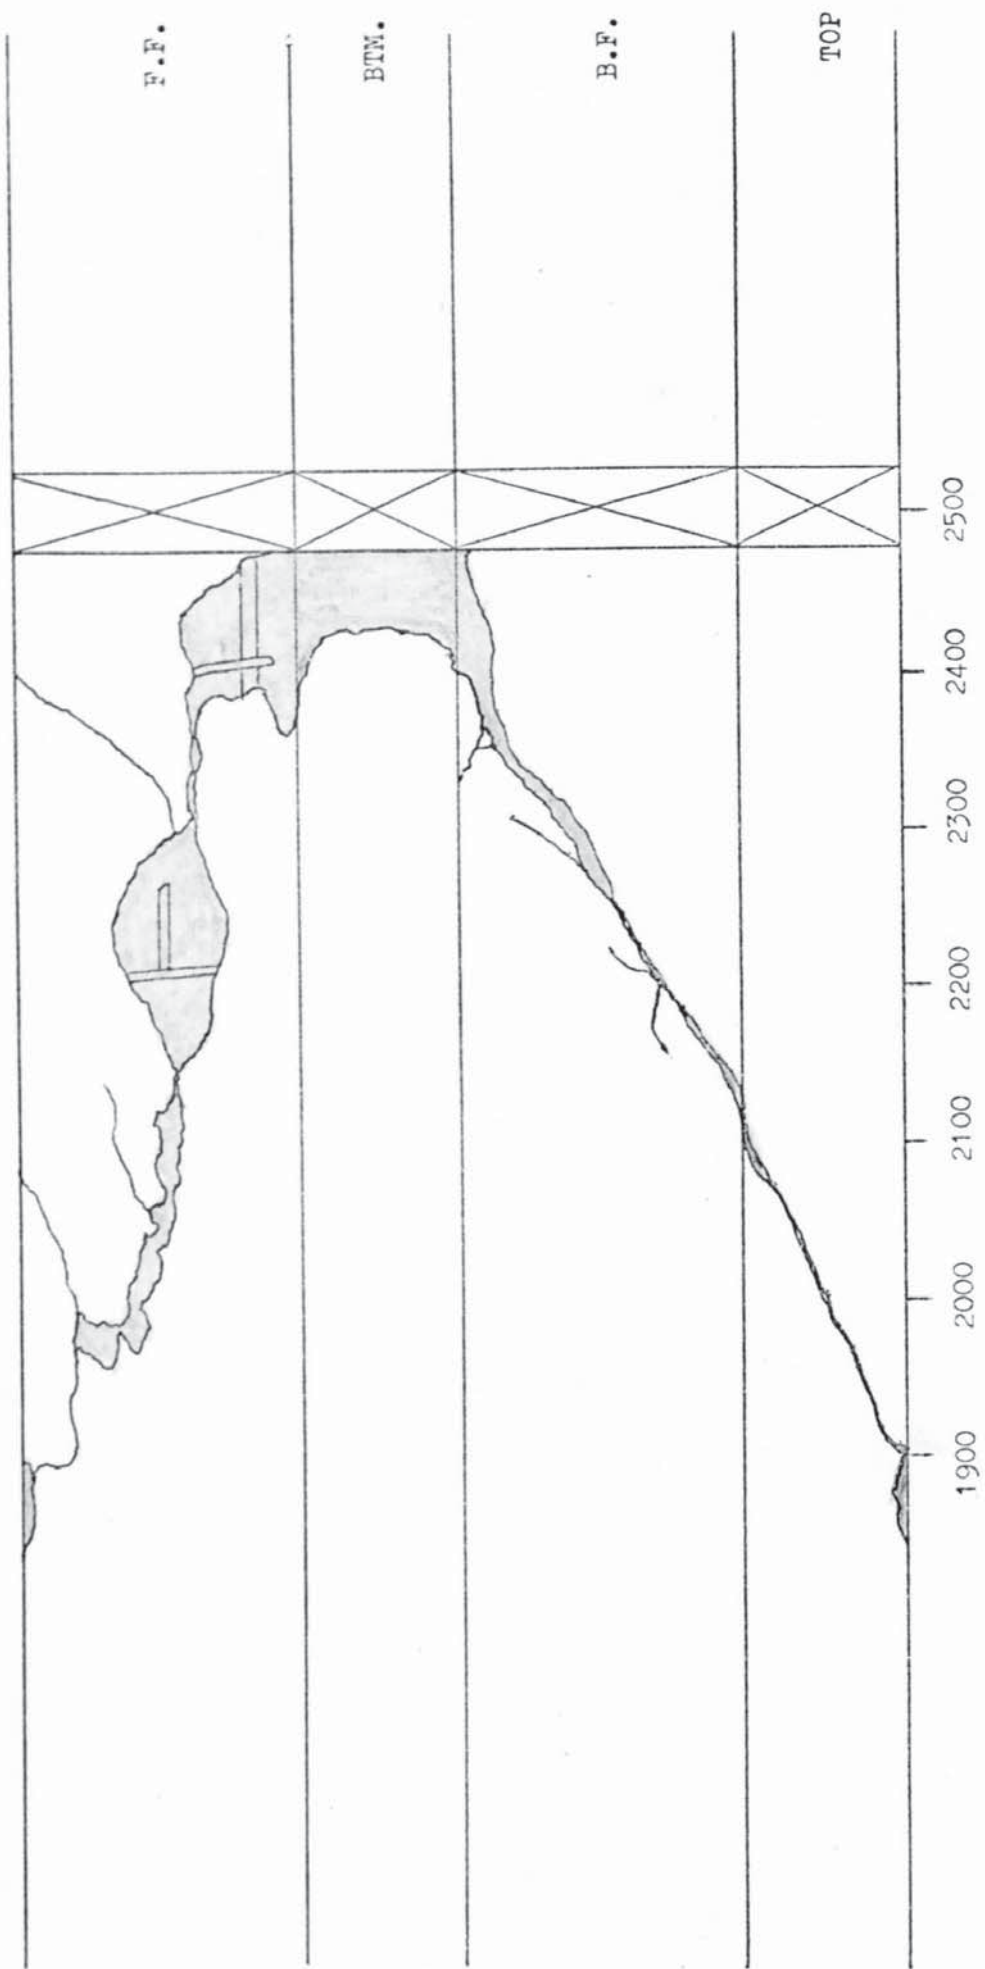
FAILURE CRACK PATTERNS - BEAM 34 ( MODE 2 )
